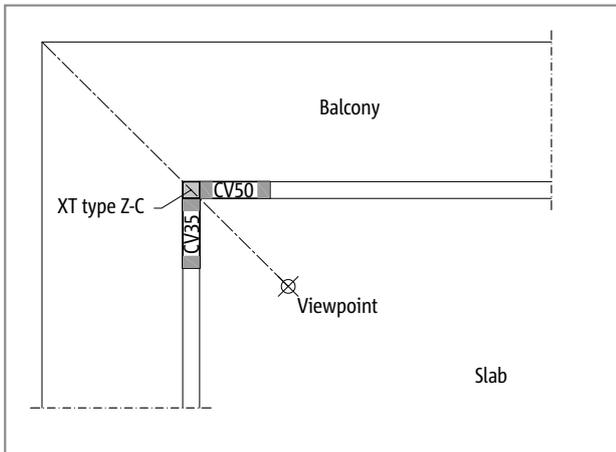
Schöck Isokorb® XT type C: Concrete cover selectable: Here CV35 left from viewpoint, concrete cover CV50 right from viewpoint
